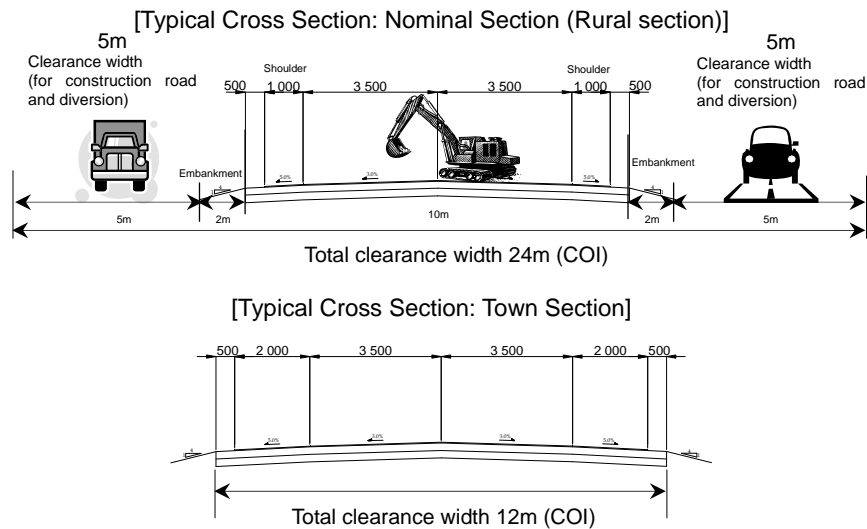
Construction Zone Concept f(Limiting Affected Area)
